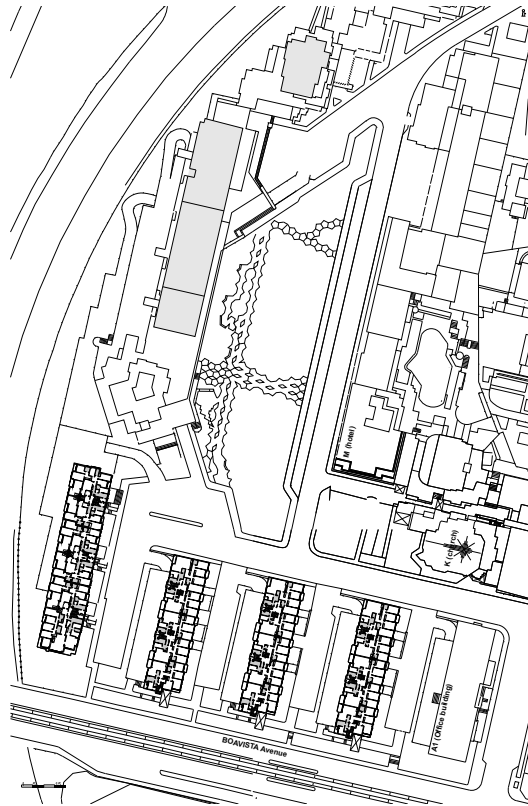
Boavista Residential Park*. Floor plan. Scale: 1/2250 (author's drawings)
